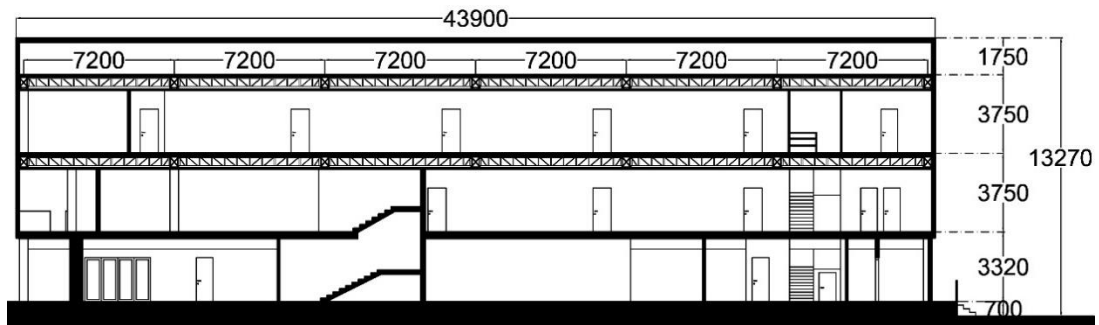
Longitudinal section of the building (denoted as B-B in Figure 1)
